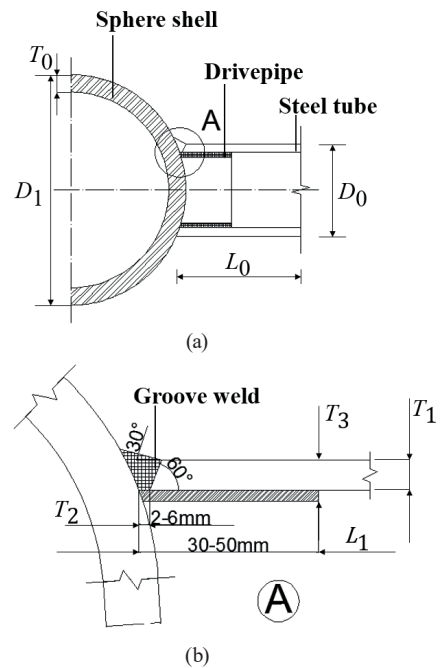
The connection requirement given by [25]: (a) Sphere shell, Drivepipe, and Steel tube, (b) Groove weld
